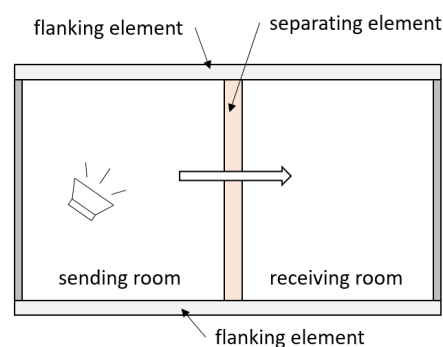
Schematic representation of the separating element and the flanking elements: a standard, rectangular wall has 4 flanking elements: 2 walls and 2 slabs (floor and ceiling)
